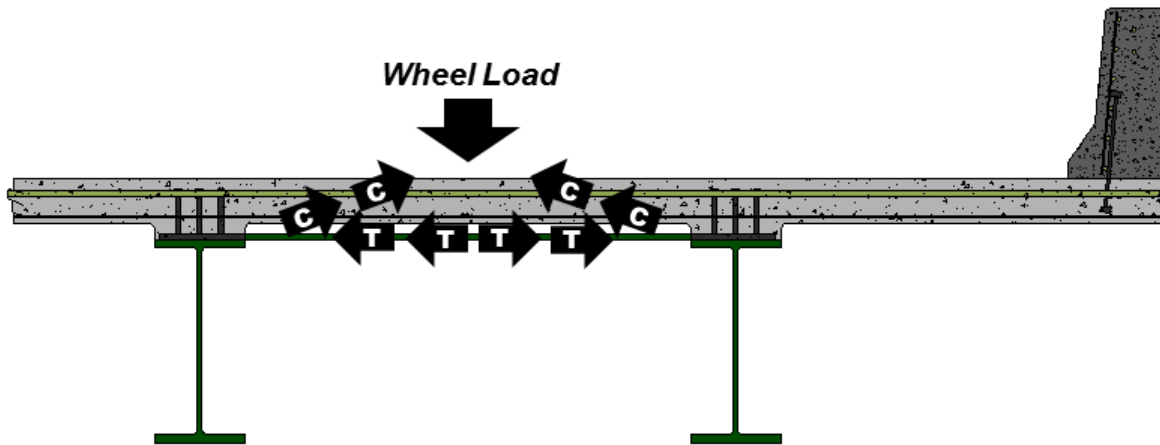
Arching-action typical to the internal panel of bridge deck slabs
